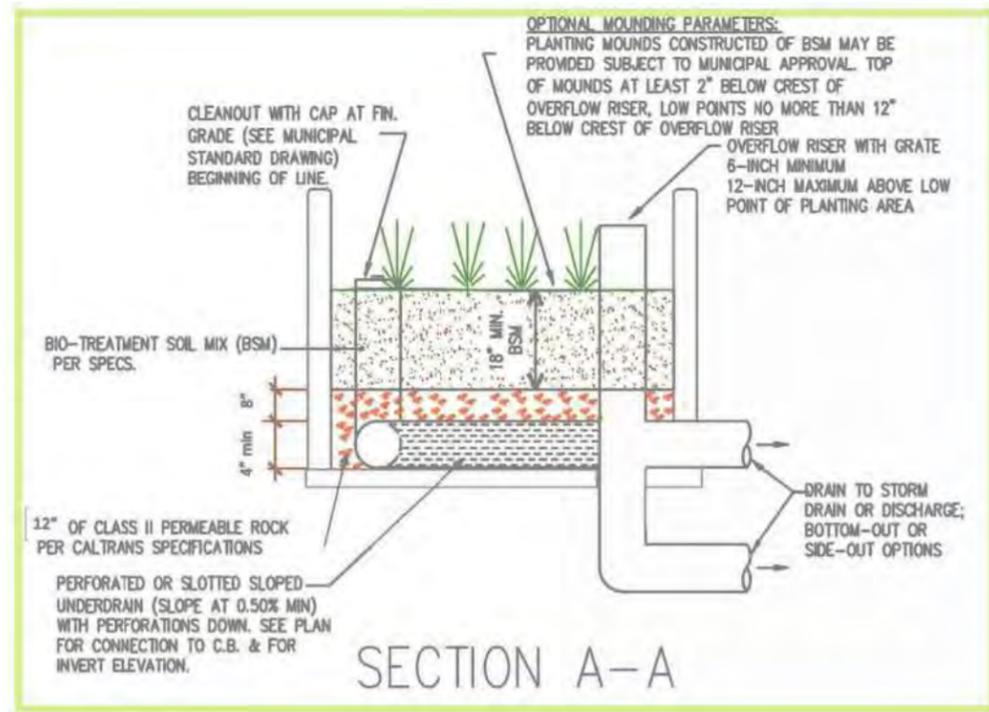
Cross section A-A of flow-through planter, shows side view of underdrain (Not to Scale)
